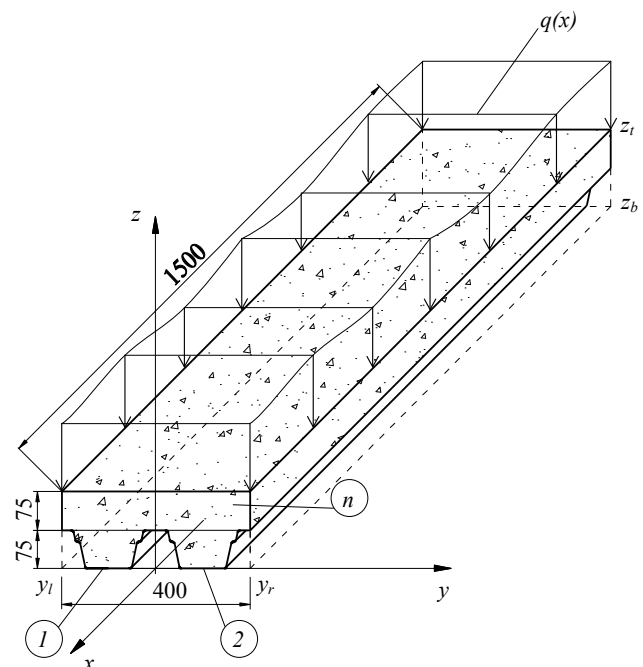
The design of the polystyrene concrete slab with profiled steel sheeting (dimensions in mm)
